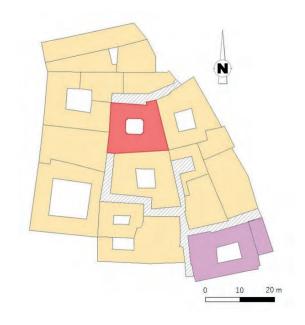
Location plan of house N° 03 - Dar Nebia in Bab El Hadid (source: the authors).
